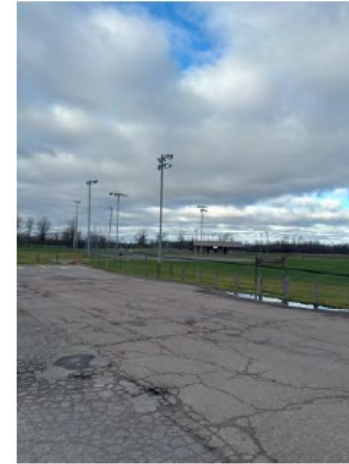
Outdoor Tye Field Light Standards, 6 total, precast concrete poles and metal halide 1,080W luminaires
